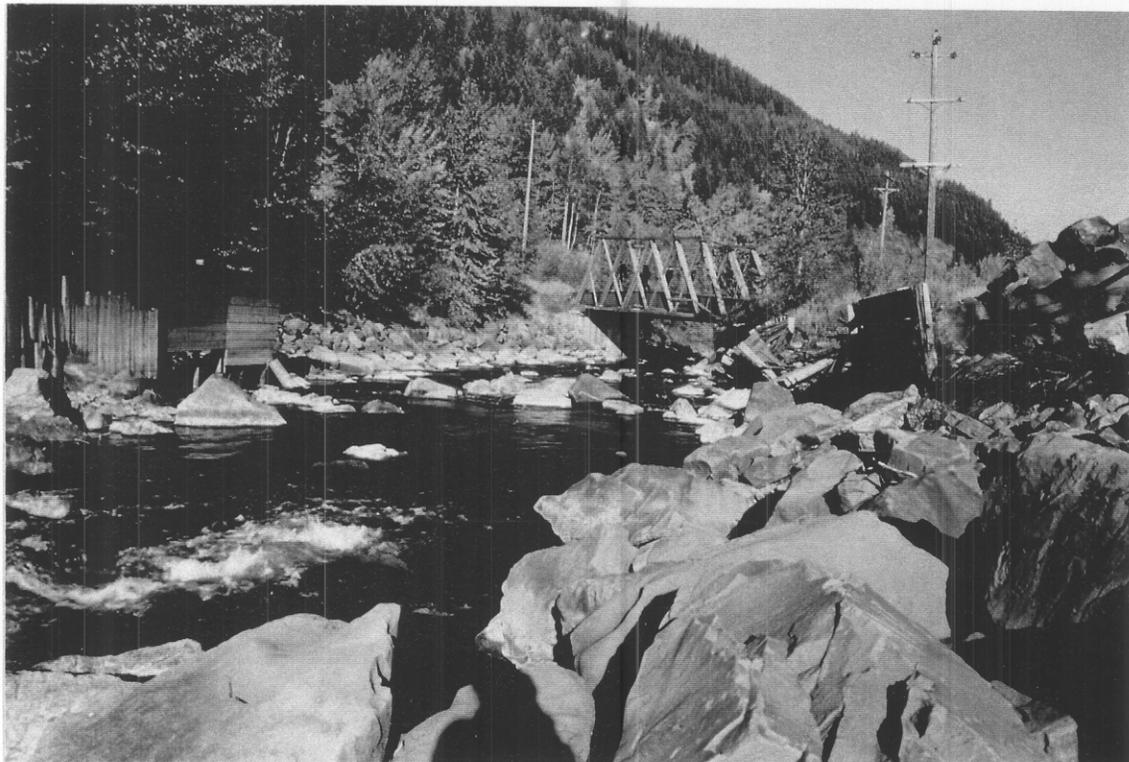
Abandoned Bridge over Michel Creek XS-35, Looking Downstream
